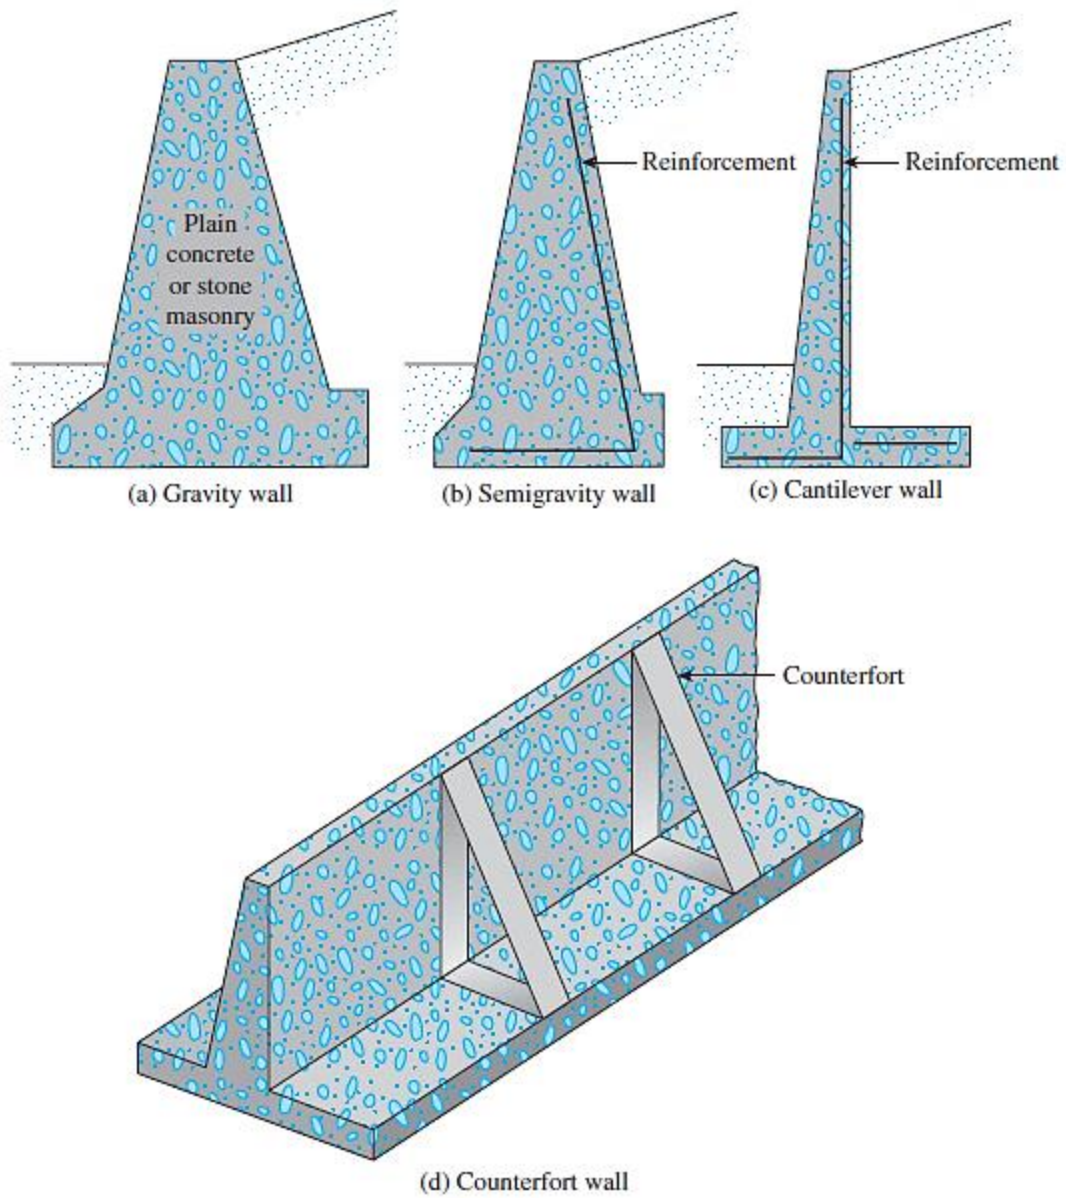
Types of conventional retaining walls (Das, 2016)
